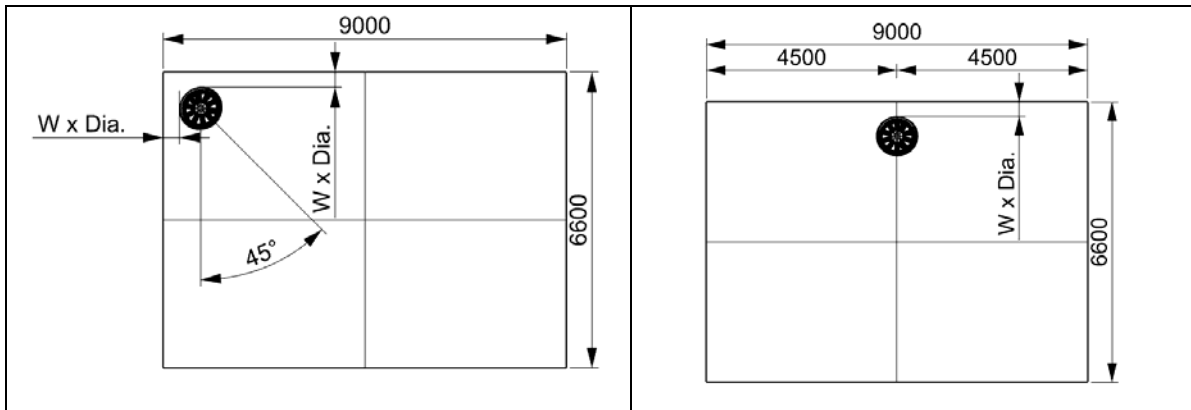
Tunnel cross-section, with a fan at a corner (left) and below the soffit (right) - all dimensions in mm
